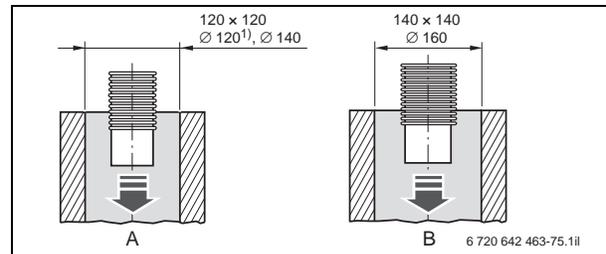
Minimum dimensions of the shaft cross-section for the installation of the flexible flue (dim. in mm)
